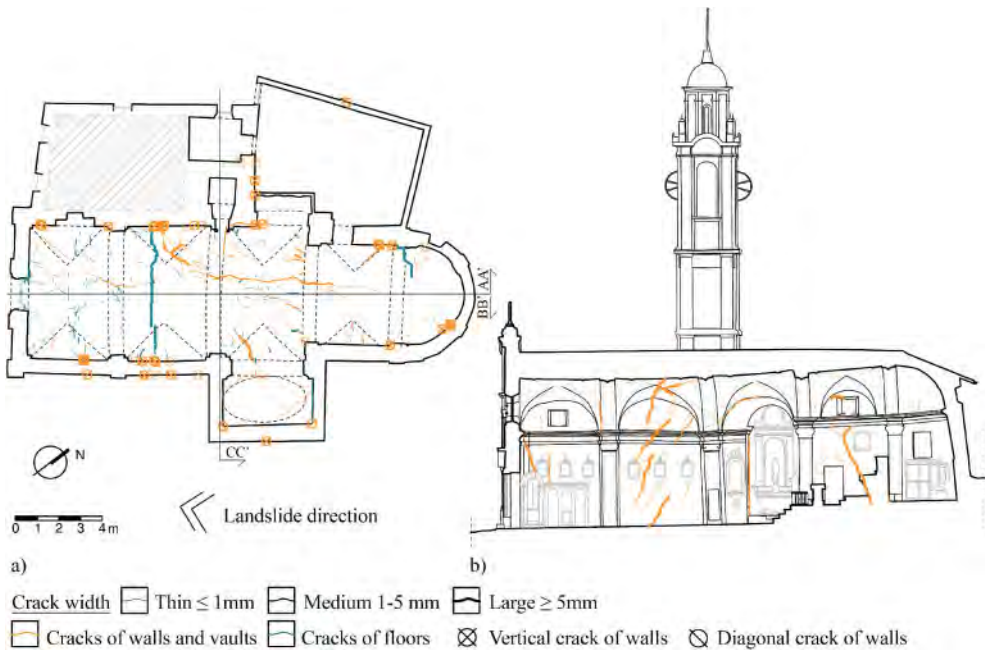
Crack pattern of San Carlo Borromeo church: a) plan, b) section AA'.
